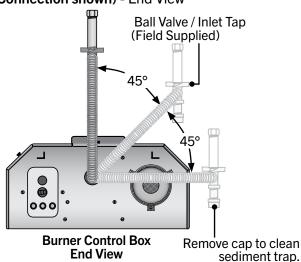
• Gas Connection (Flexible Gas Connection shown) - End View
